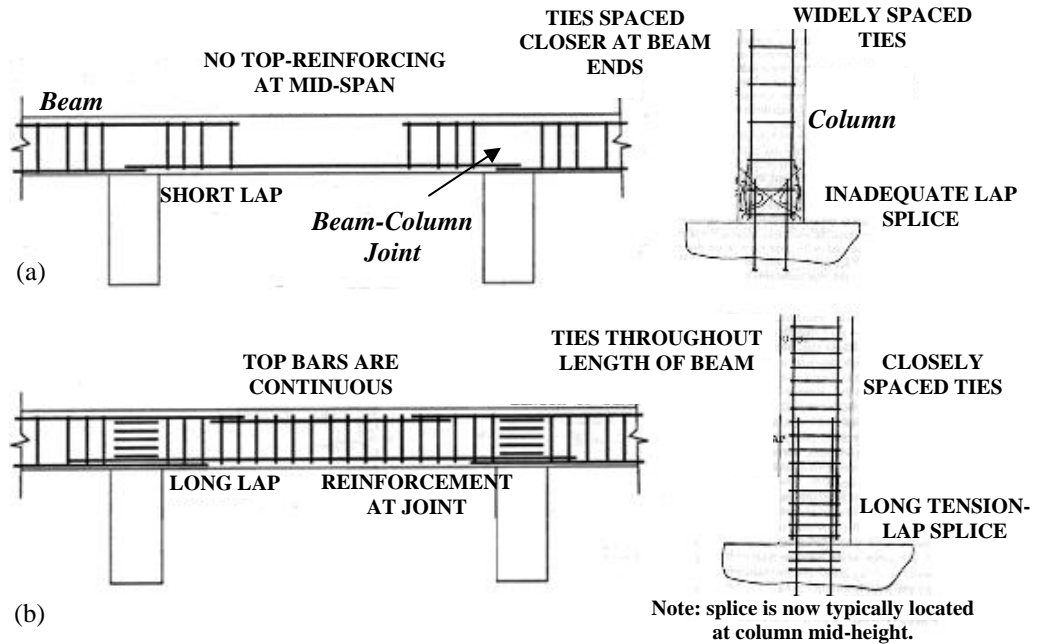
Typical detailing of (a) non-ductile and (b) ductile RC frames, based on Thiel et al. (1991).
